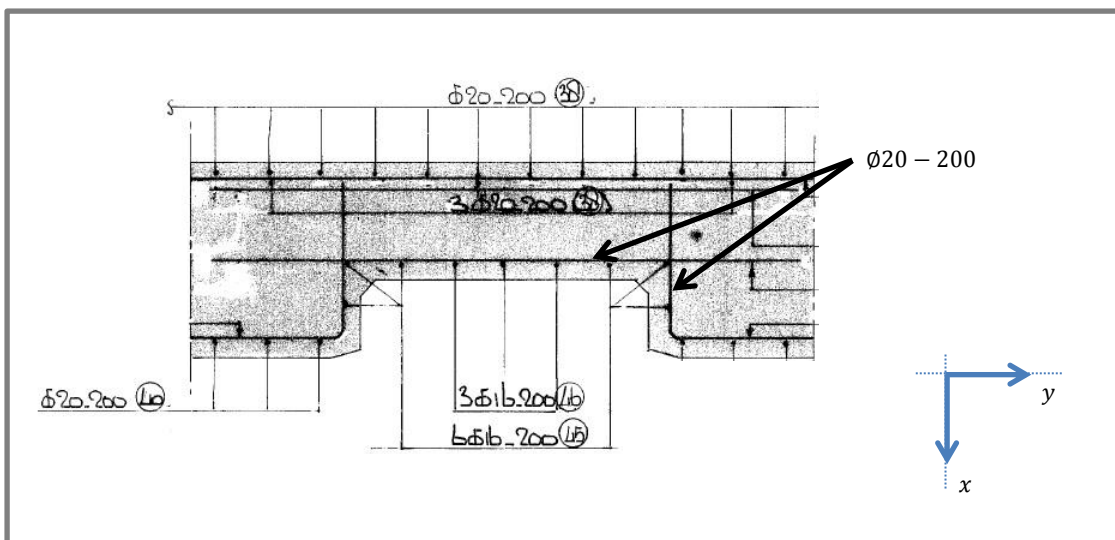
Cross section of recess in top view with reinforcing steel indicated. Adapted from unpublished technical drawings of the lock complex.
